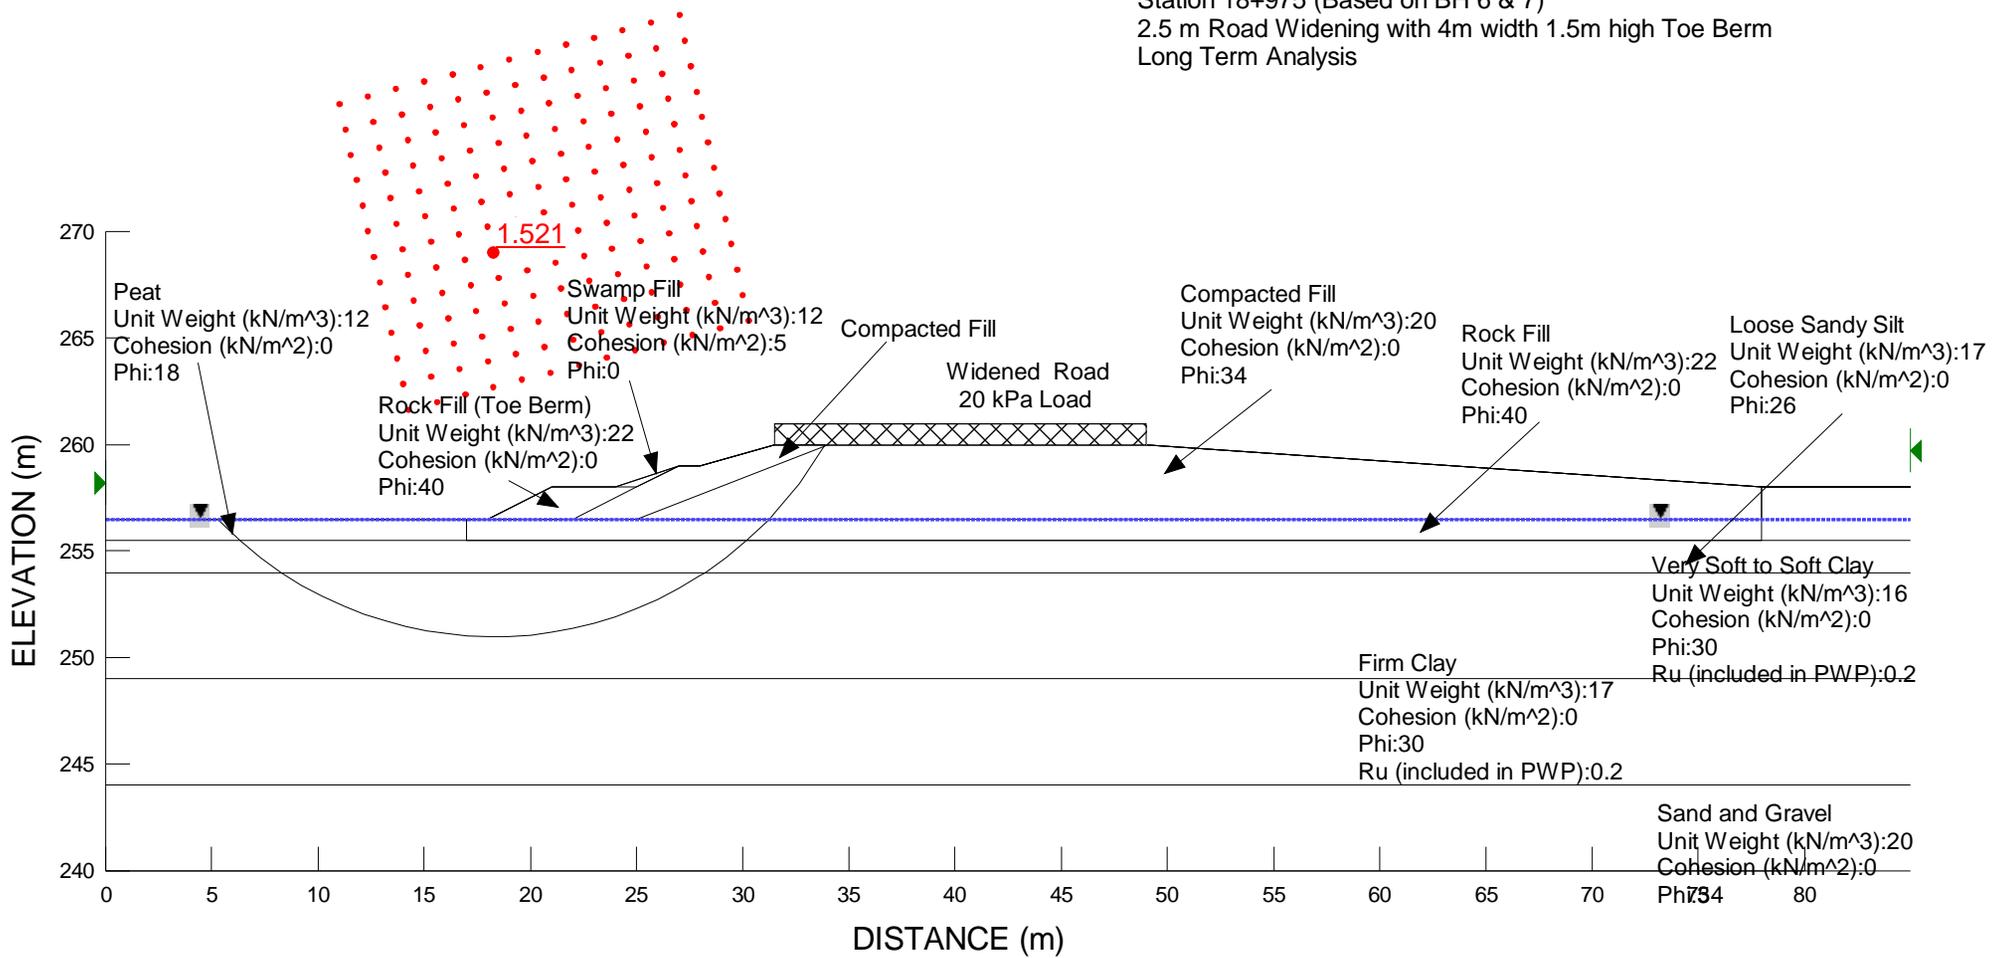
Slope Stability Analysis of Section at Station 18+975 - 2.5 m Road Widening with Toe Berm (Long Term Analysis)
